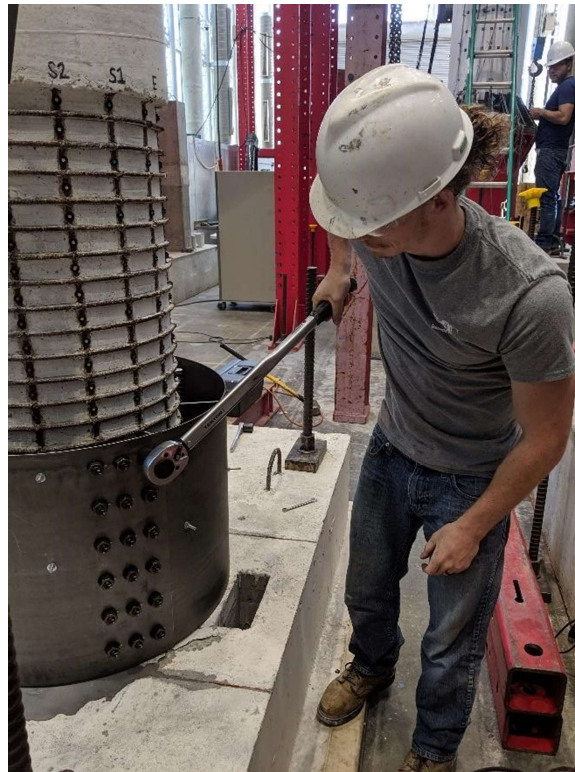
Pre-tensioning of Bolts via Calibrated Torque Wrench.
